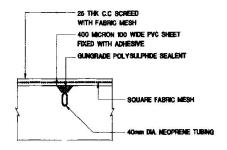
Typical Joint between Precast units in Longitudinal Direction
